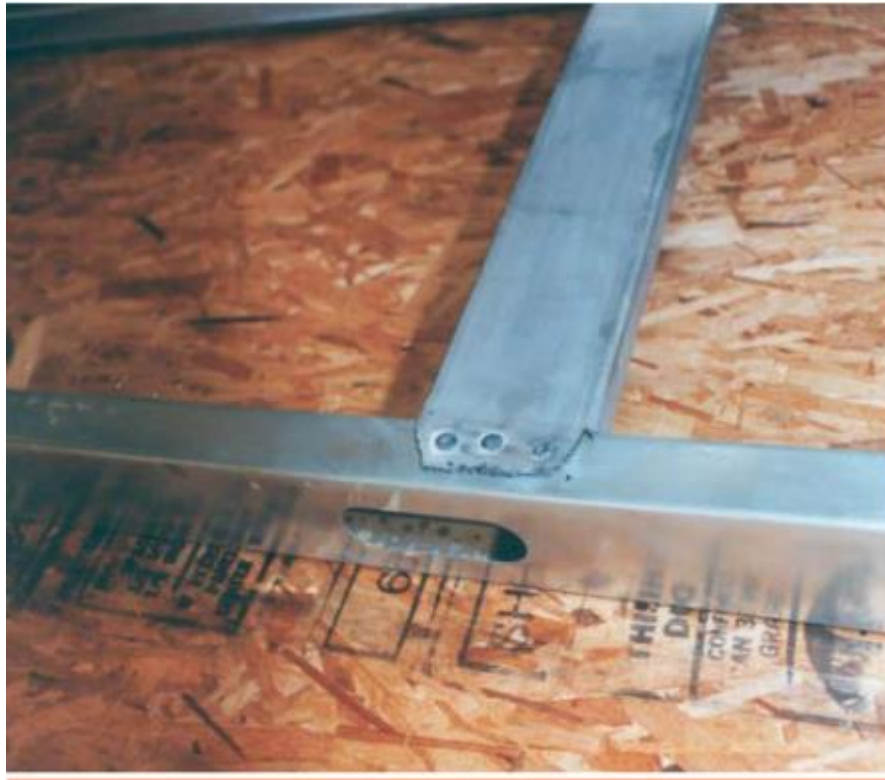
Plug welds are common in sheet steel construction but limited in their use on heavy structural steel.
